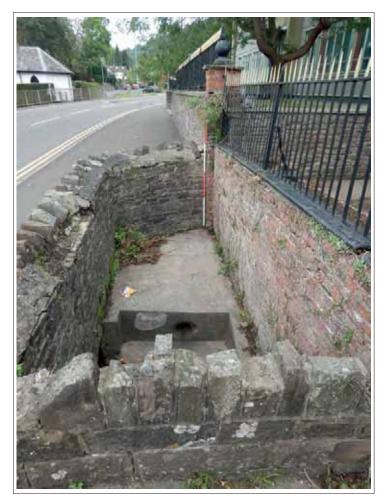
Culvert to the front of Mulberry House, looking north. 2m scale.
